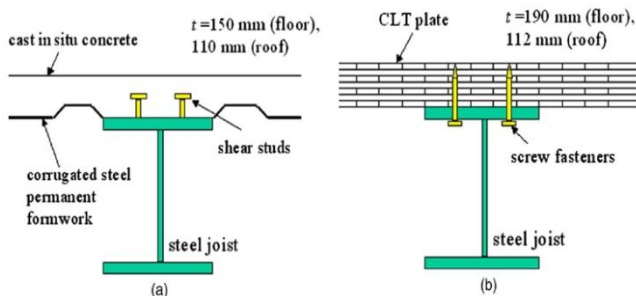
Floor connection systems: (a) reinforced concrete floor; (b) cross-laminated-timber.
